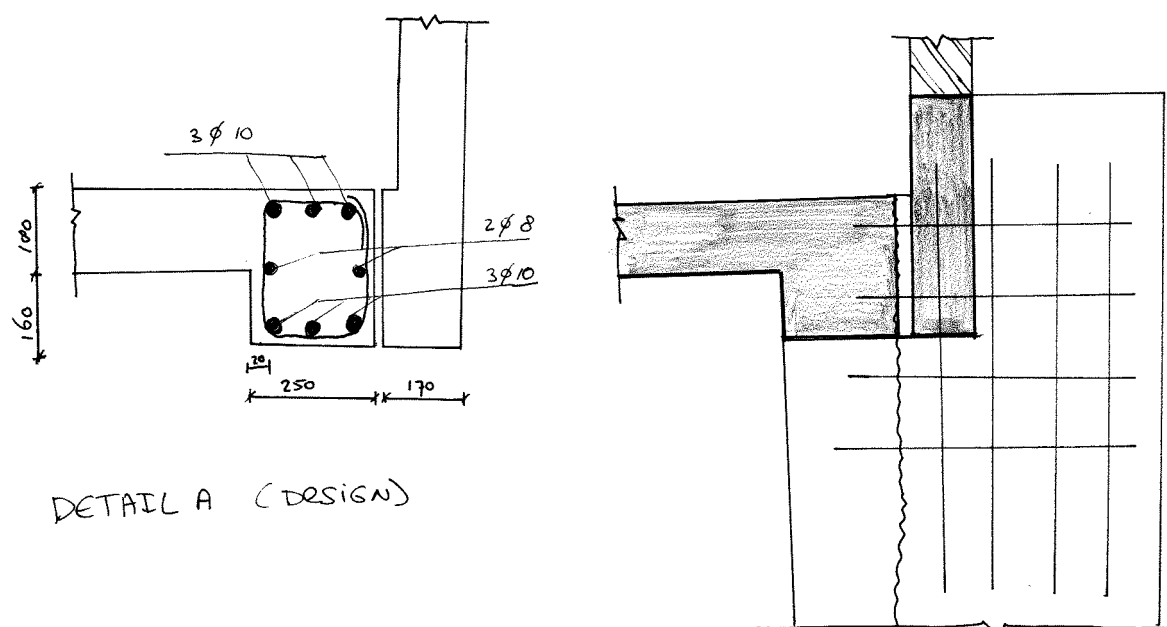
Connection between the damaged beams, Dilatation designed (L) Workdrawings (R)
